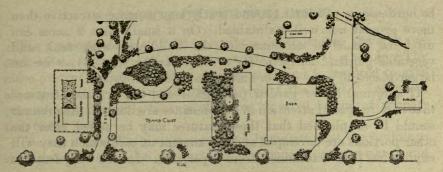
A plan for a farmstead when a good house, barn, and tenant house were already erected close to the public road.
